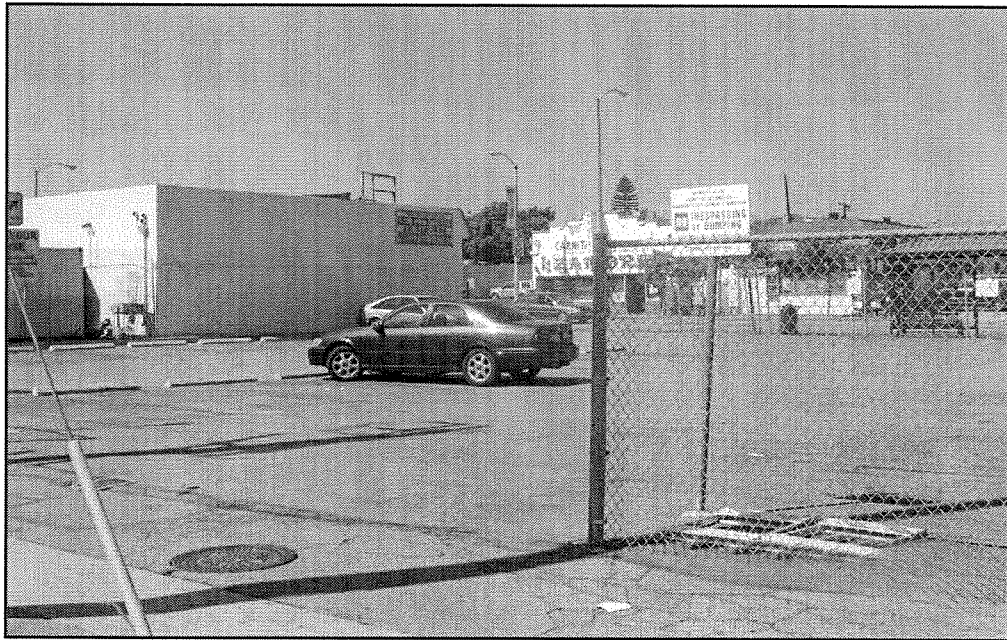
View of project site looking south from north side of Cesar Chavez Avenue.
